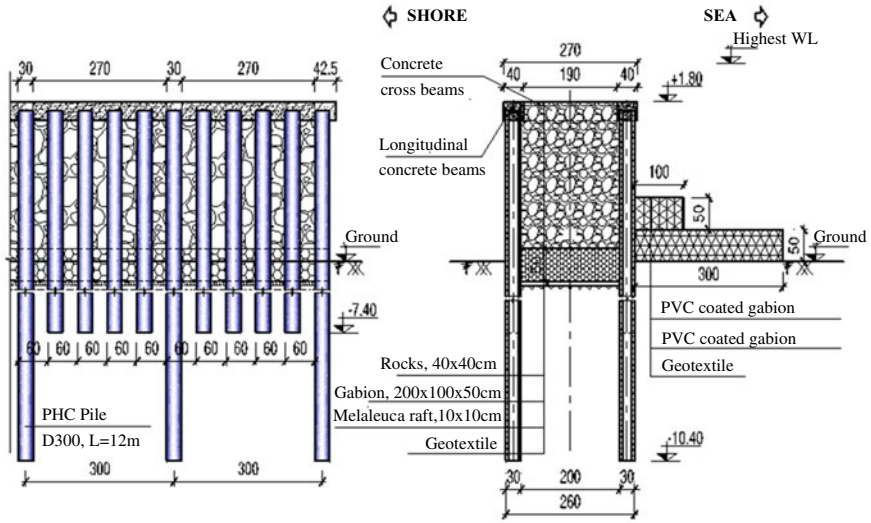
Typical cross-section of spun piles–rock detached breakwater in Ca Mau
